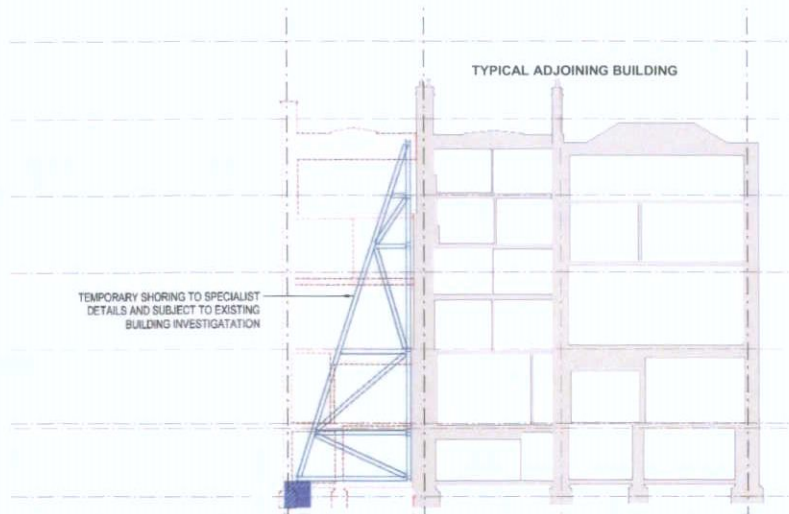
Typical Temporary Boundary/Adjoining Retention System
